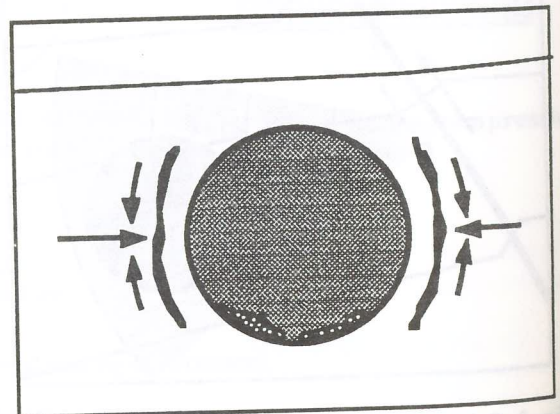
Rockburst manifested by sideways spalling and slabbing of tunnels walls.
